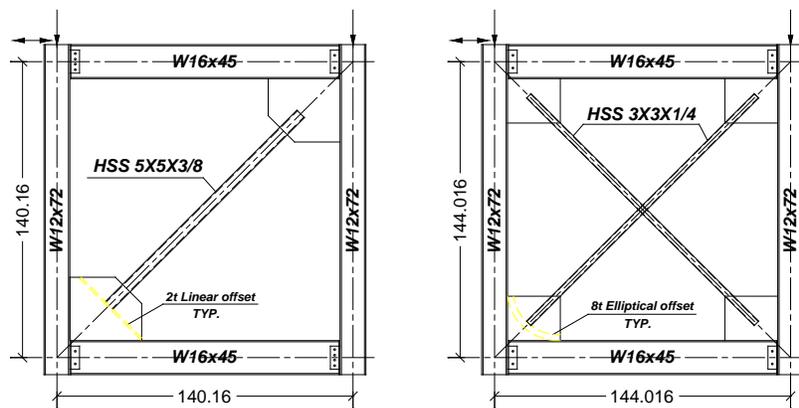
Typical test specimen for single-story single-bay SCBF: diagonal-braced HSS1 (left) and X-braced HSS31 (right).
